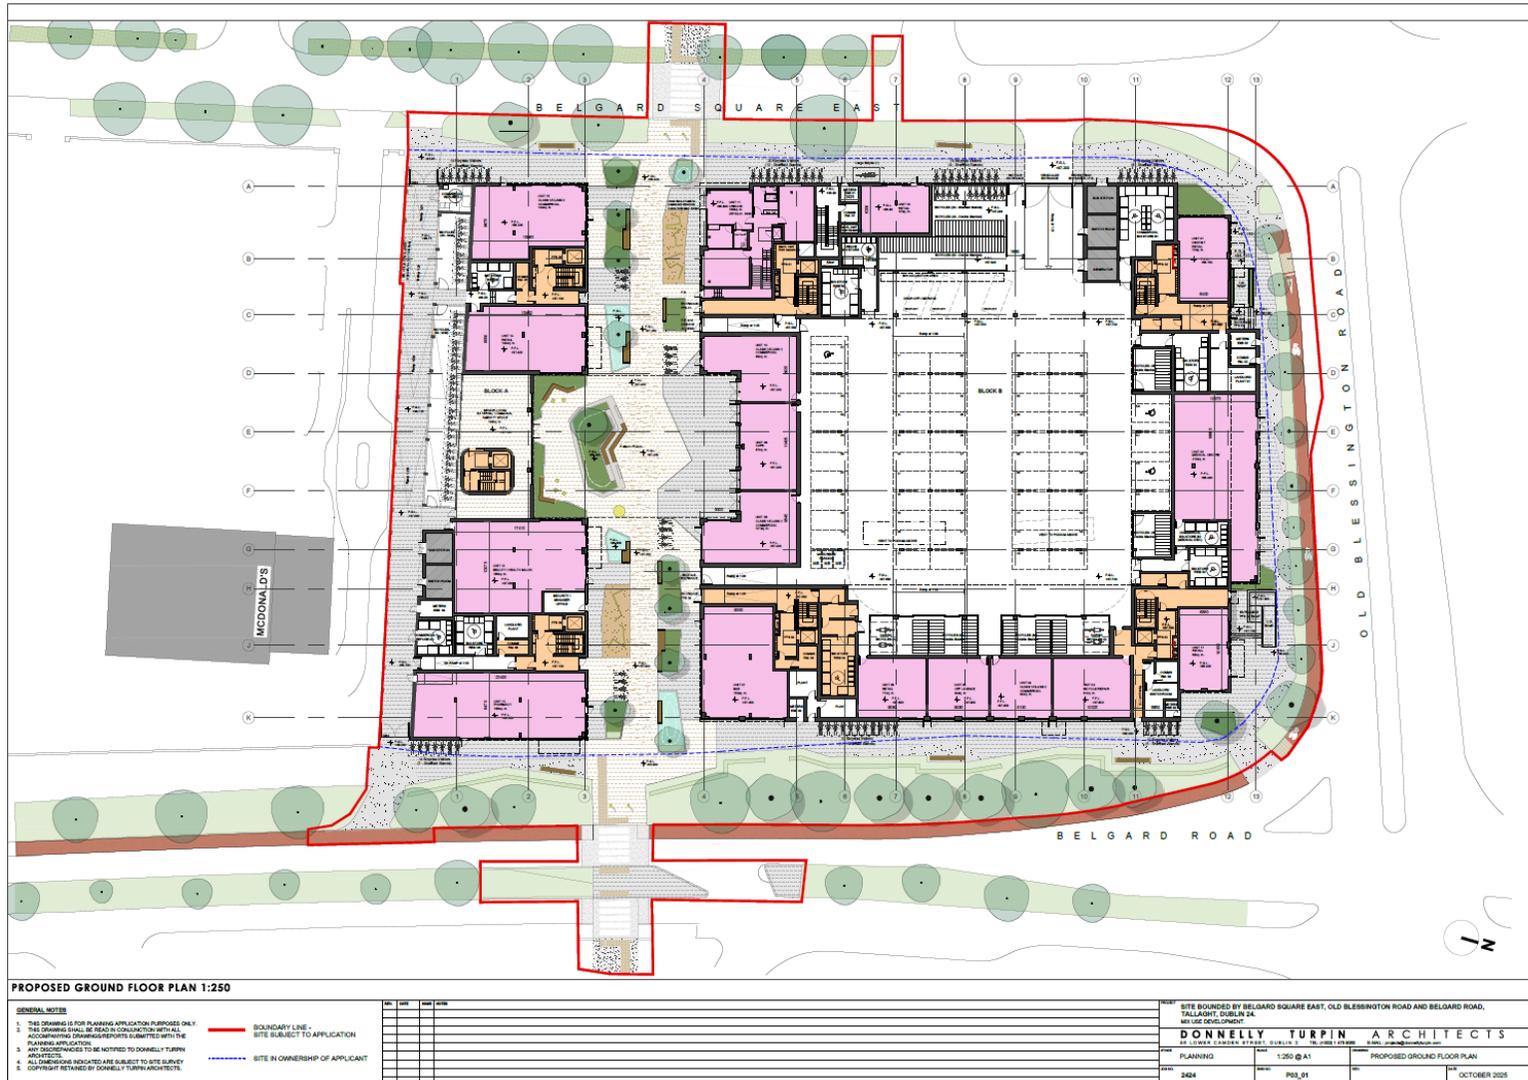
PROPOSED SITE LAYOUT. DWG No. 2424_P03_01 (DONNELLY TURPIN ARCHITECTS, 2025).
